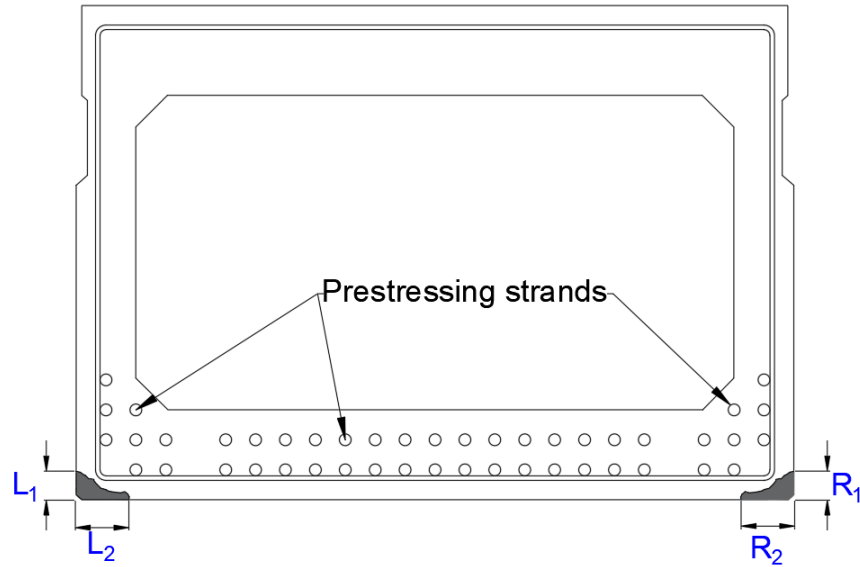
Measurements to define bottom flange edge spalls
